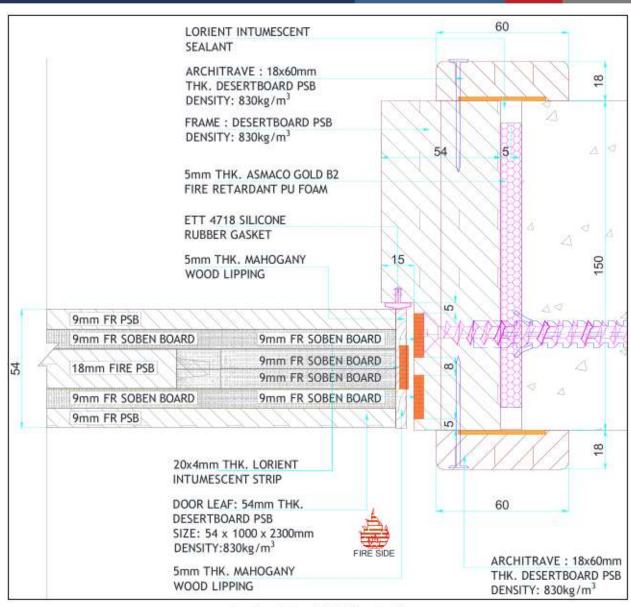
Vertical section view of the doorset B. (Drawing provided by the test sponsor)
